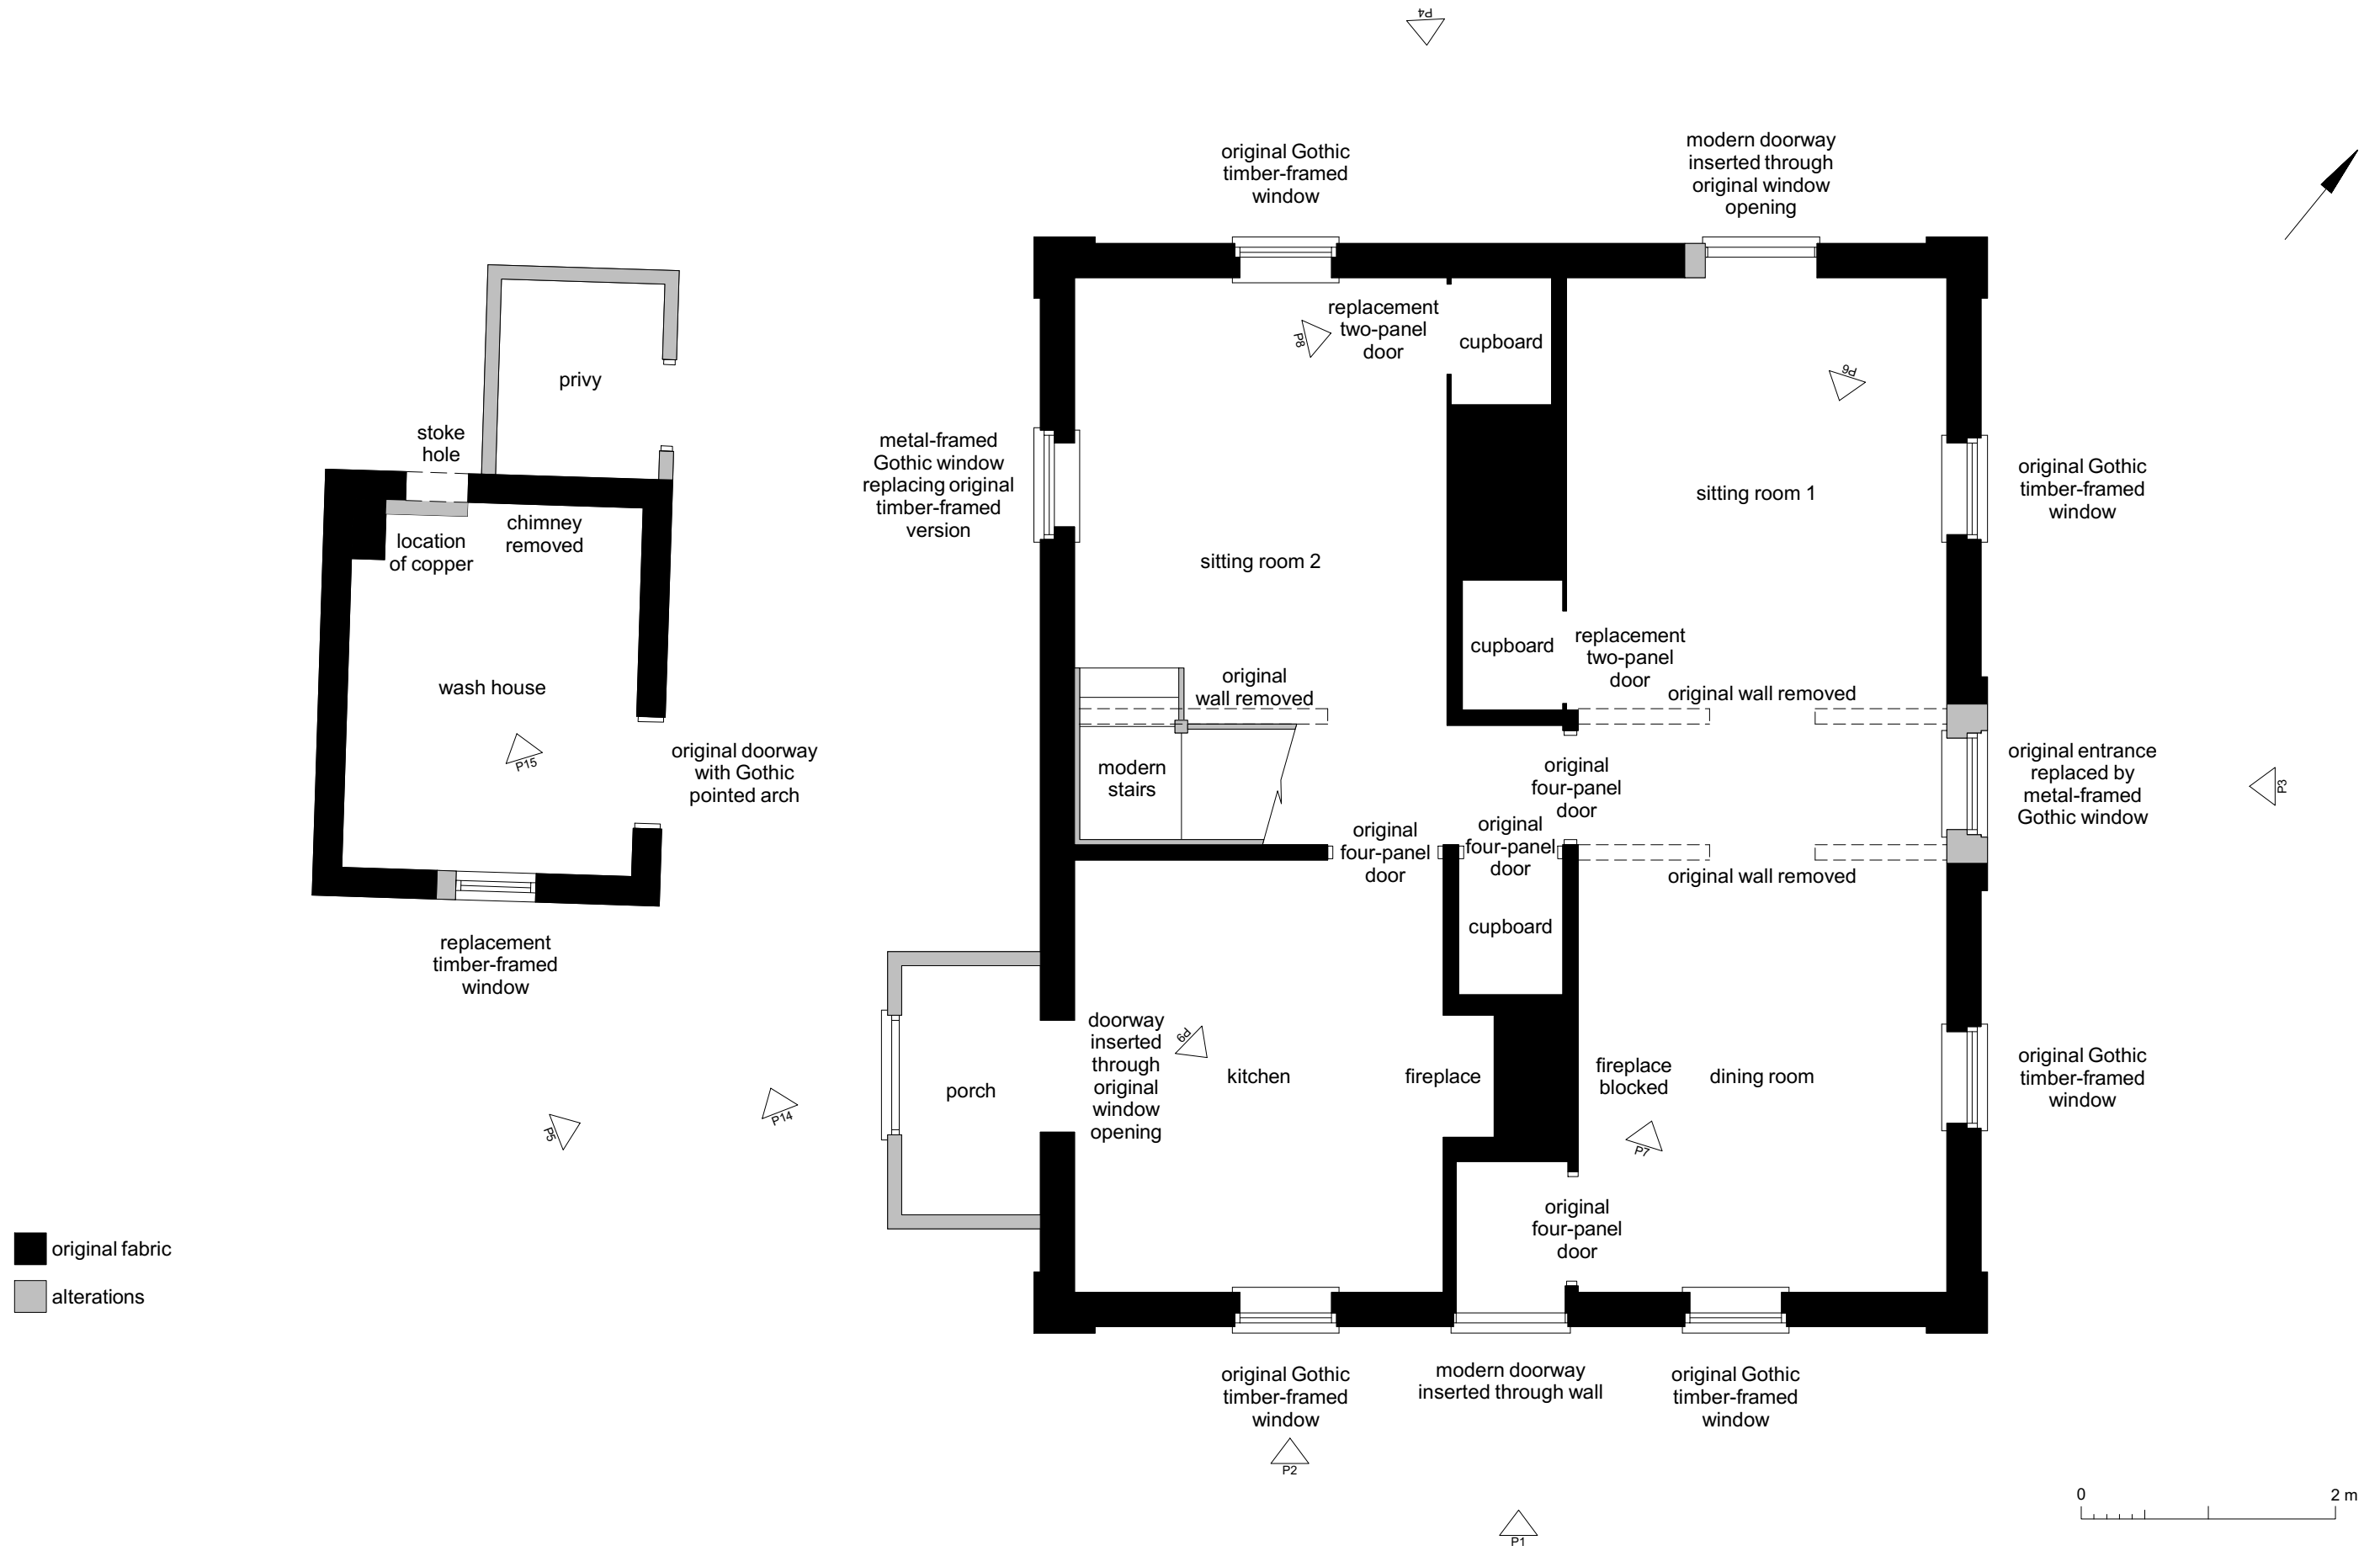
Ground floor plan of the farmhouse and wash house. The numbered arrows indicate the location and orientation of photographs included in this report.
